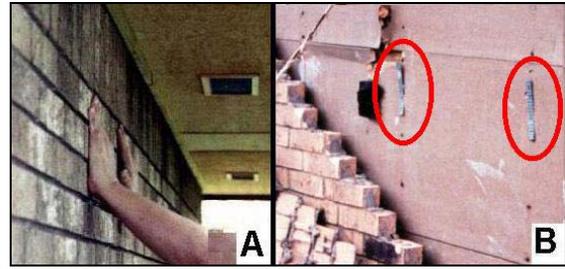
Brick masonry deficiencies: A) masonry wall that could be flexed by hand, and B) removal of brick revealed wall ties (circled) did not engage masonry.
